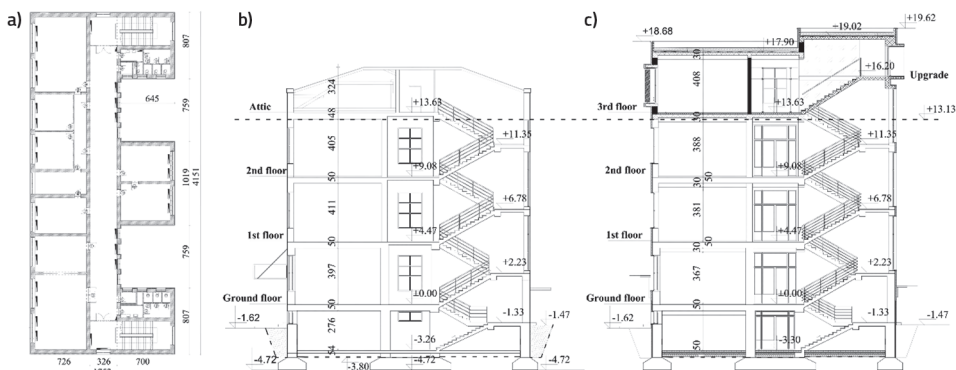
a) Characteristic storey layout, and transverse cross-sections of the b) existing and c) upgraded building
